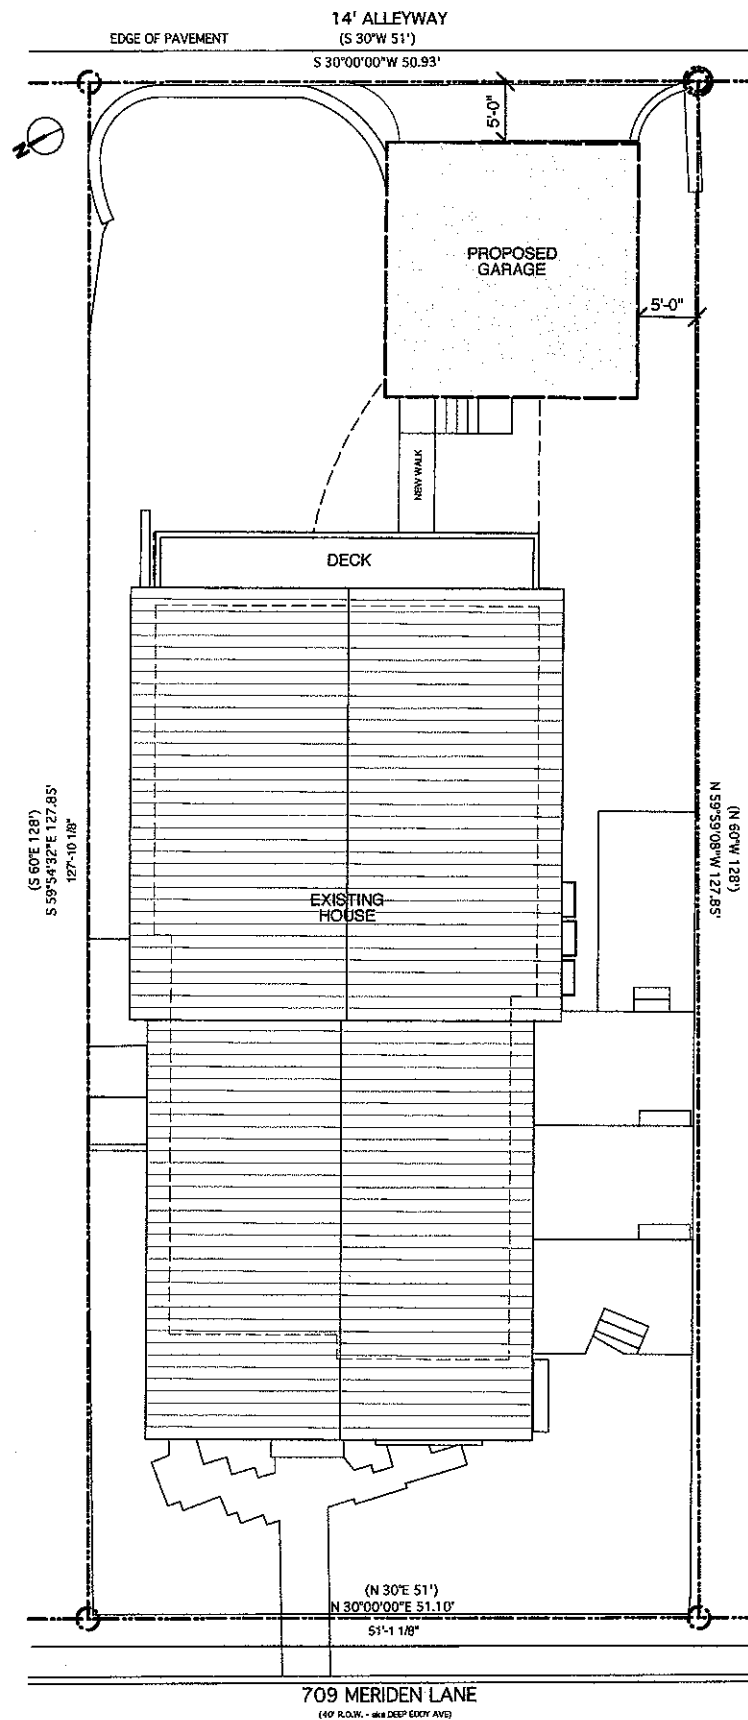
Proposed site plan. Scale: 1/6" = 1'-0"
